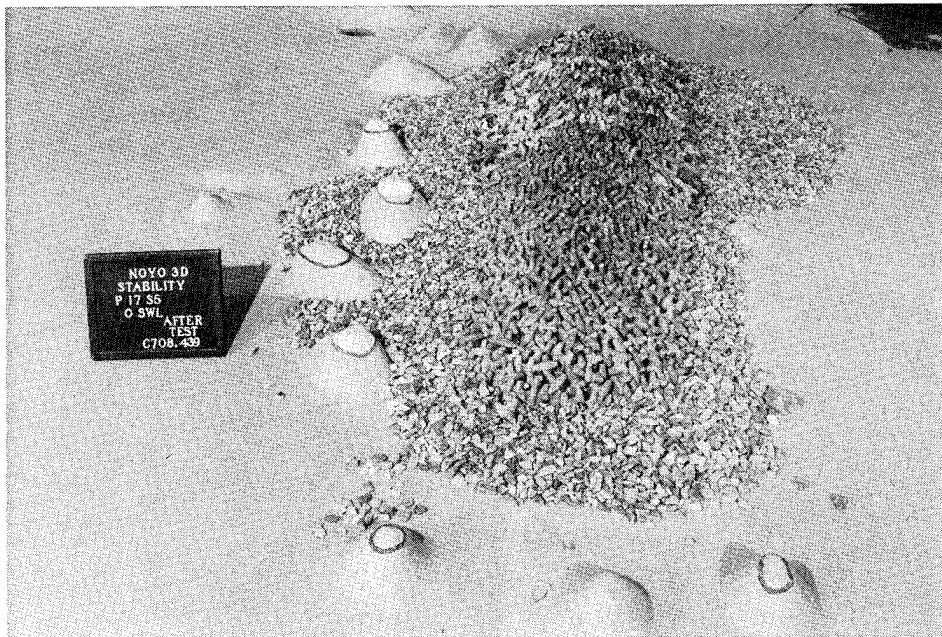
Plan 17, south roundhead after five series of modified Storm IB waves at +0 m mllw
